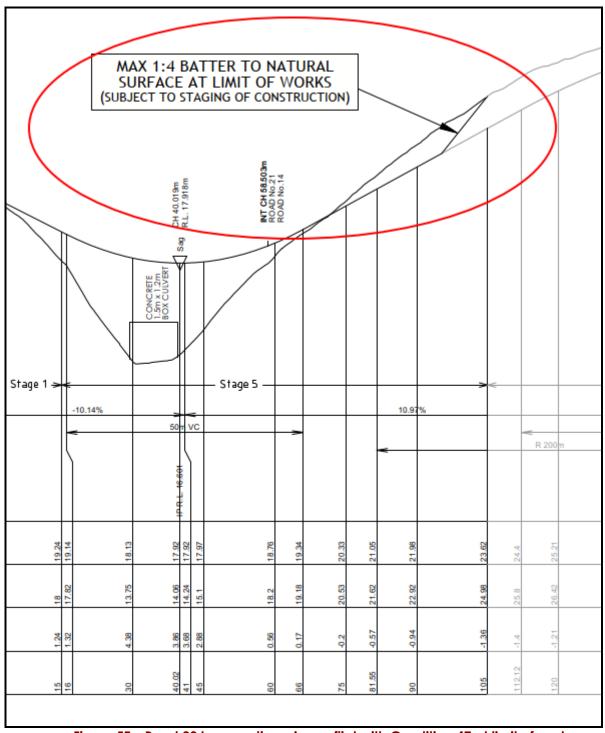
E – Road 20 long section – in conflict with Condition 47 at limit of works.
